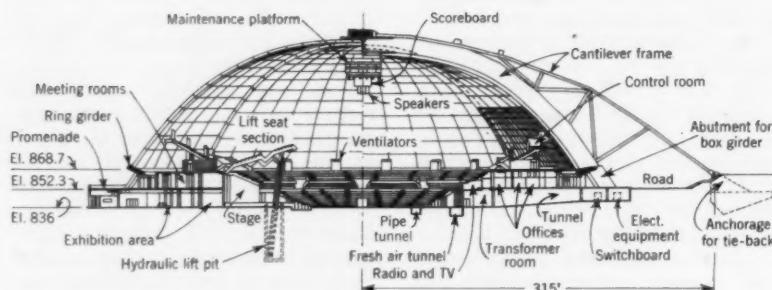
Cantilever space frame supports the eight leaves of the roof in open or closed position. Note seat section that is lifted to provide a long stage.
